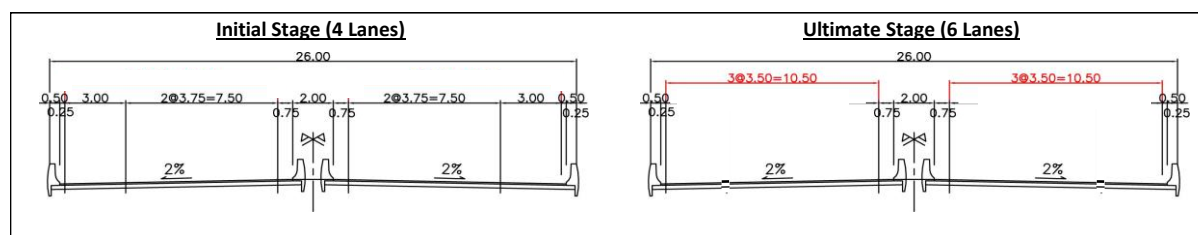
Typical Cross Section of Ky Lam Bridge in the F/S
